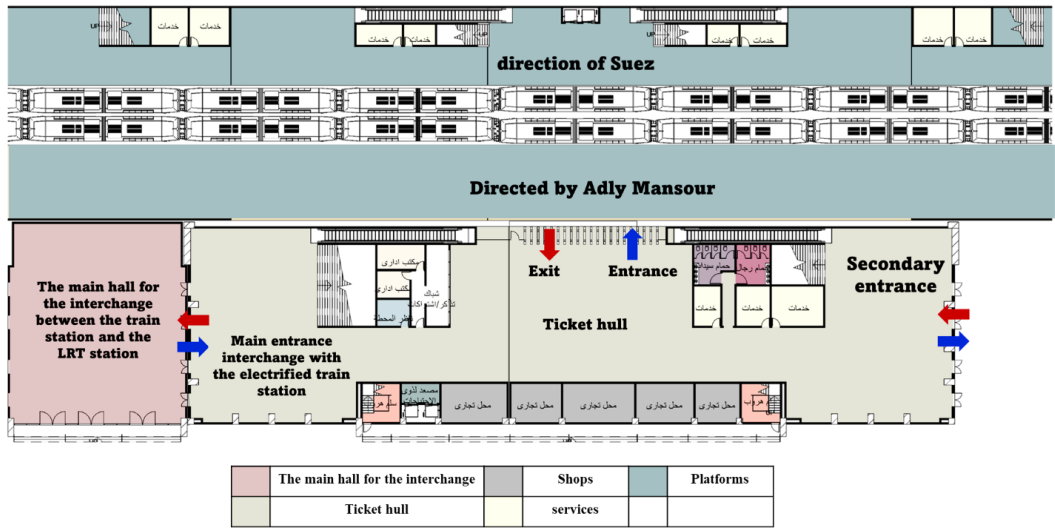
Ground floor of train station in Badr station, Source: National Authority for Tunnels.(Tunnels, 2022).
